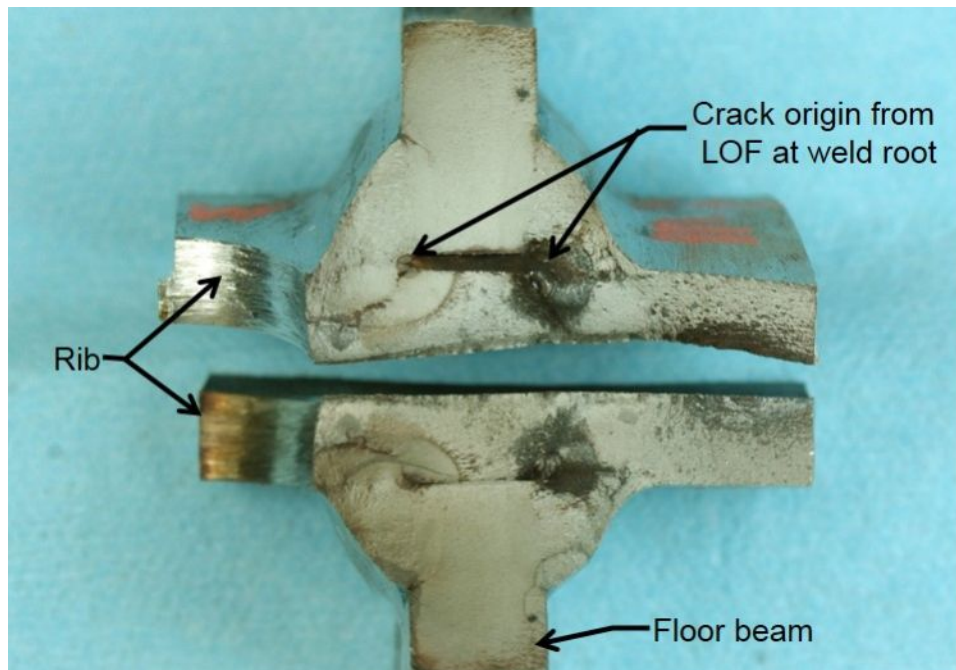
Mating fatigue fracture surfaces for the crack to the south of rib in MU2
